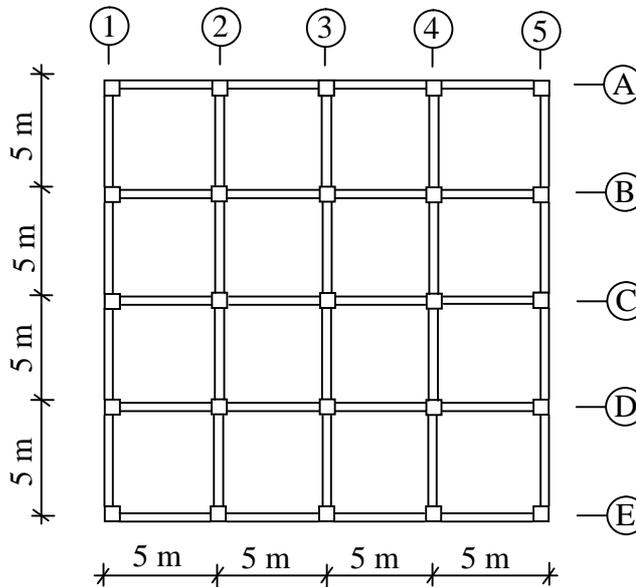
Floor plan for the RC 5.1. and the RC 5.2.
